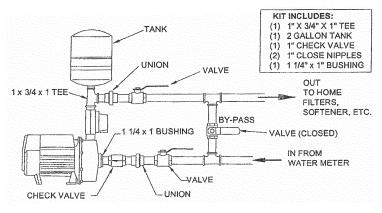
A check valve and expansion tank installation kit. © *ITT Goulds Pumps.
